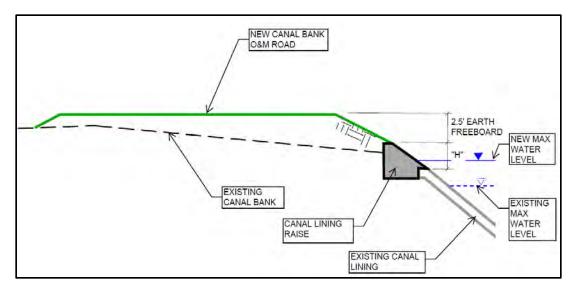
Canal Lining Raise in Segment 1 and Segment 4b of the Recommended Plan
